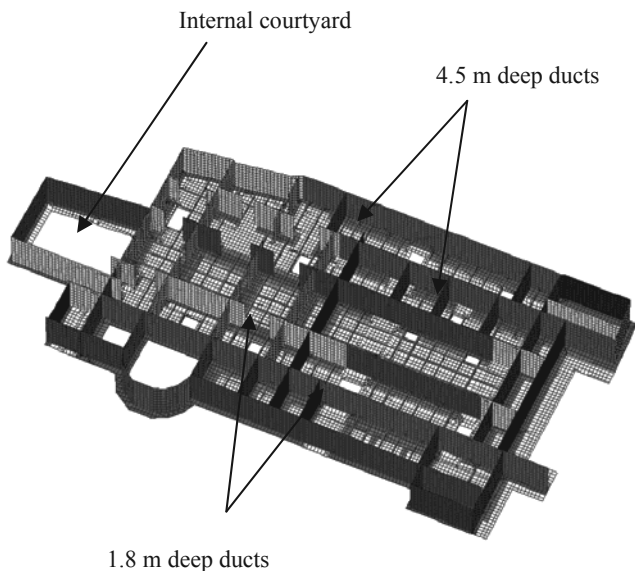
Conservatory underground model with 1.8 and 4.5 m deep service ducts
